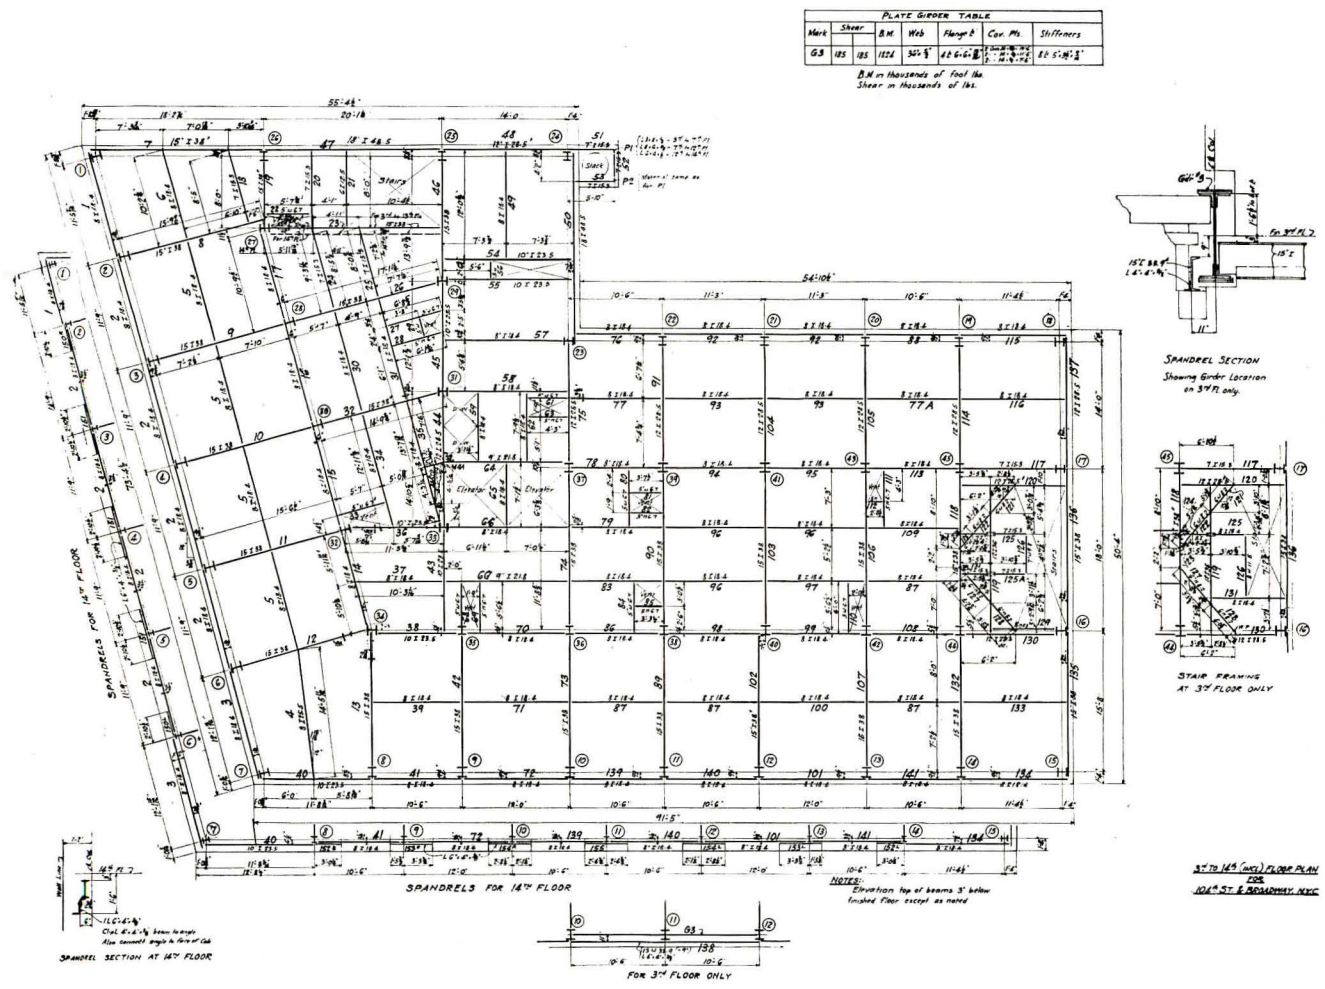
Steel Framing Drawing for the Typical Floor of Non-housekeeping Apartment Building for Realty Sureties Inc., New York City. Carrere & Hastings, Architects.
